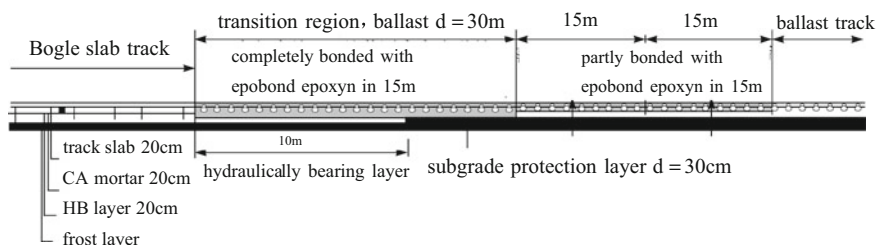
Transition section between the ballast track and German Bögge slab track on subgrade
